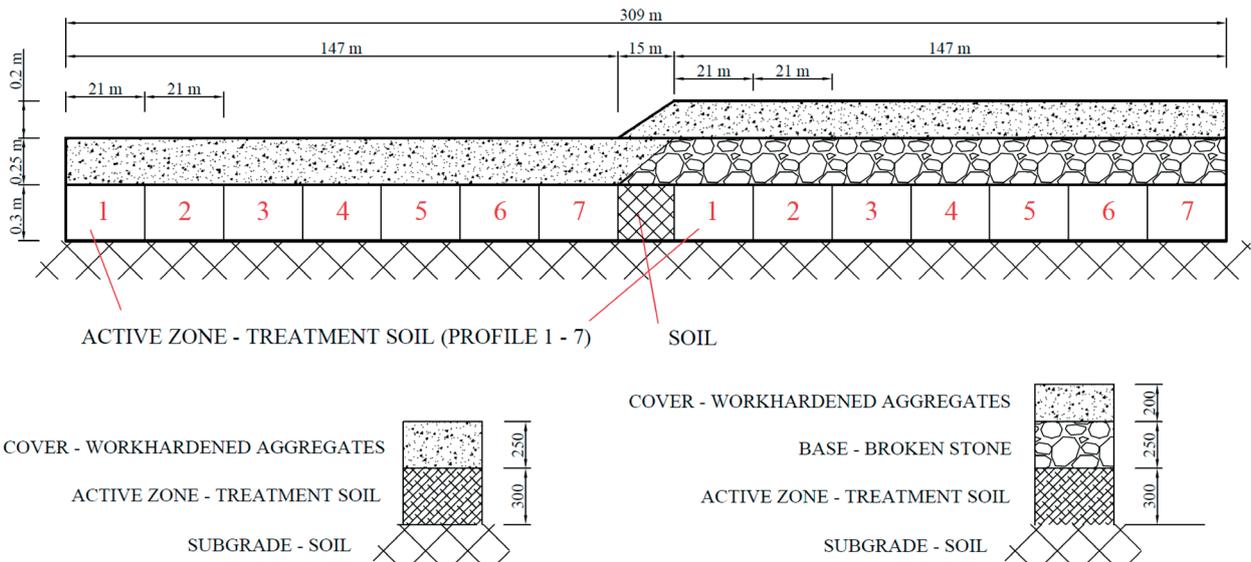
Longitudinal and cross sections of Kuběnka forest road
